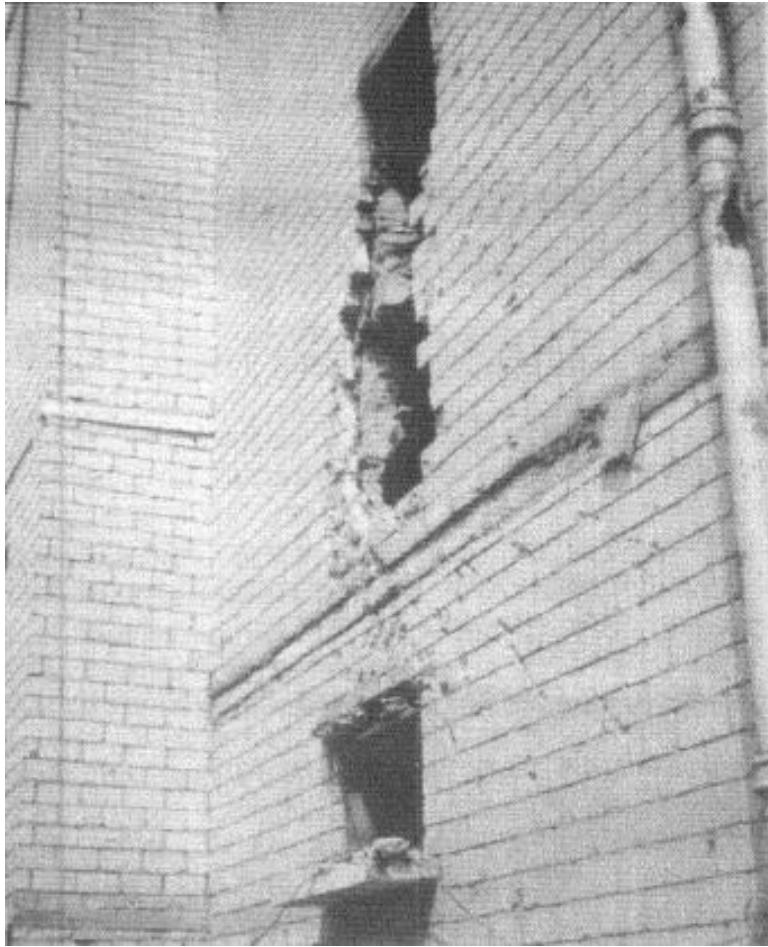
Unreinforced masonry bearing wall subjected to shelling and fire.
